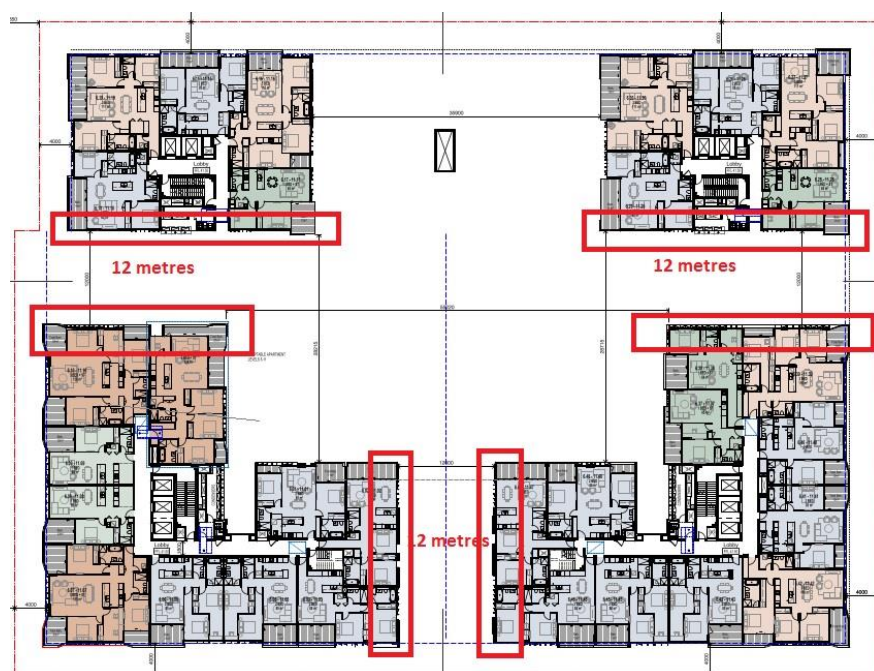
Tower floor plan diagram indicating the non-compliant separations between the towers.
